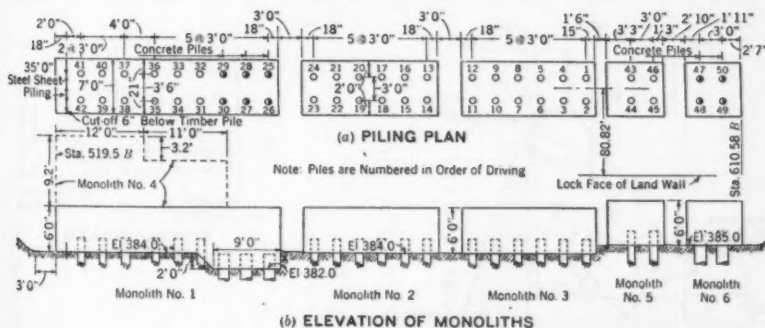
PLAN AND ELEVATION OF TEST MONOLITHS.
